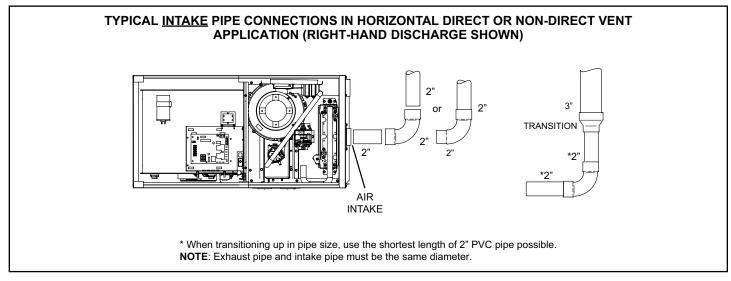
Typical Air Intake Pipe Connections in Horizontal Direct Vent Applications (Right Hand Discharge Shown)
